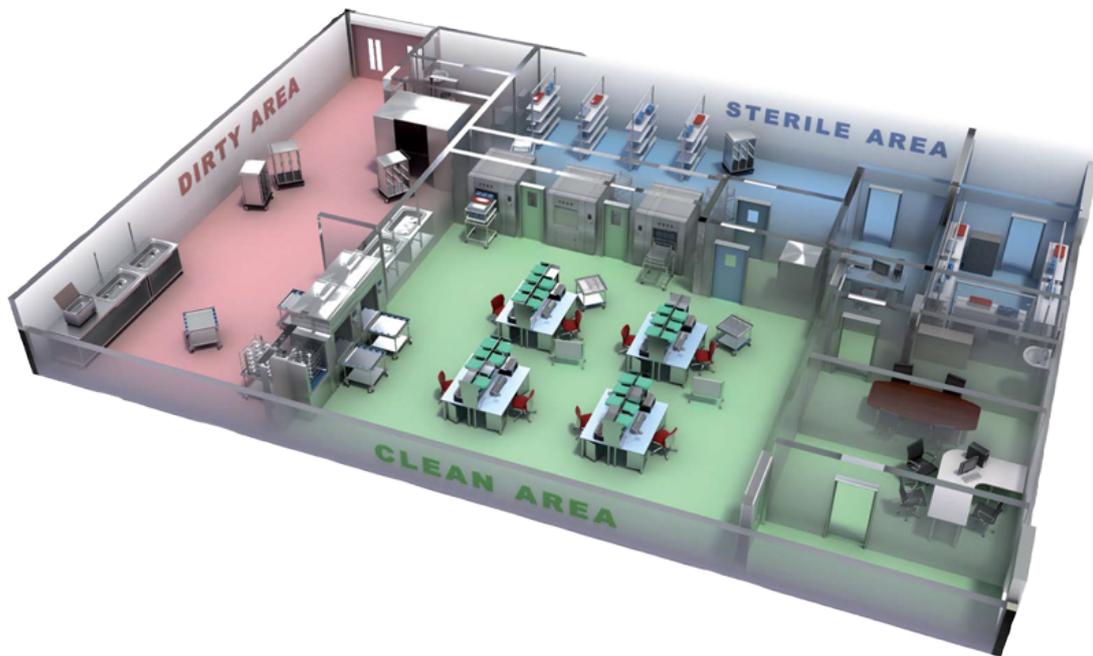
Typical floor plan of a CSSD. Image courtesy of Tuttnauer [29].
